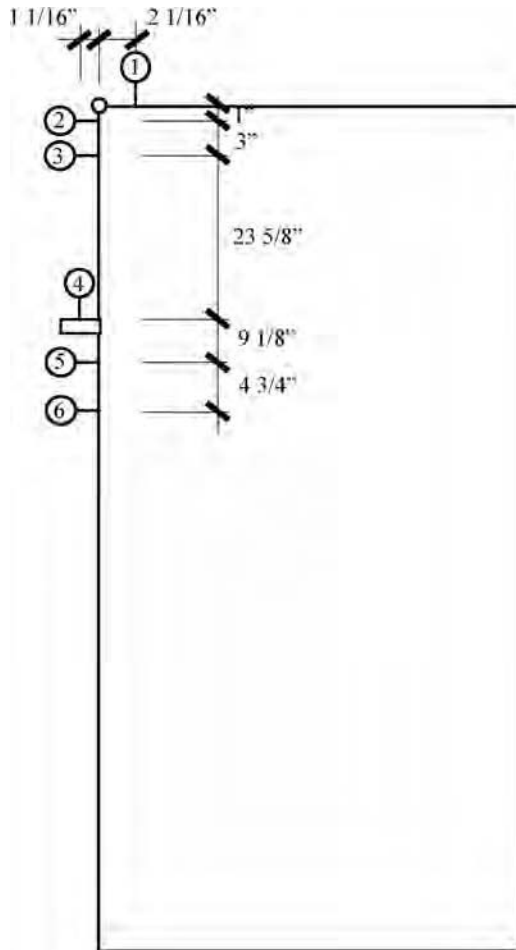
Full-scale test assembly 2 gauge location schematic.
